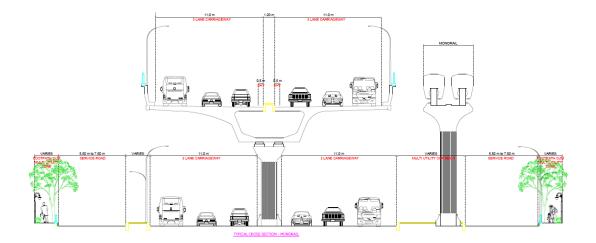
Typical Cross Sections - K R Puram to Hebbal Section
